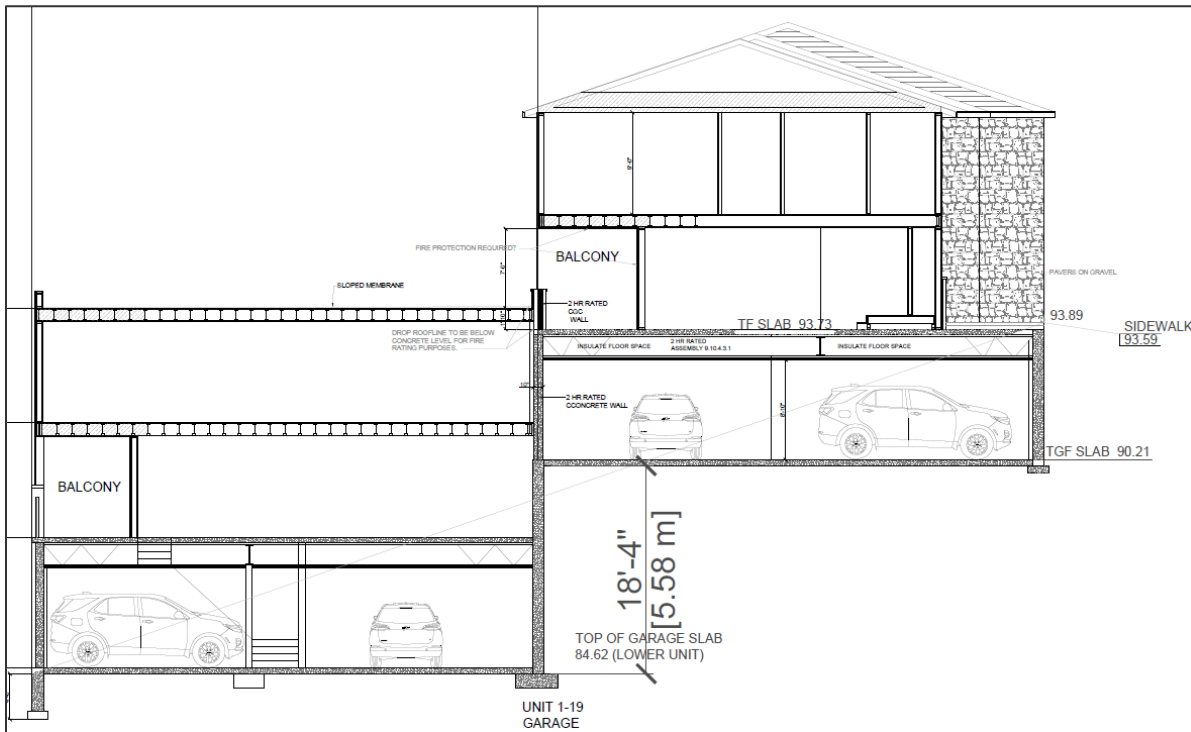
Building Cross-Section (Source: Glenn Dowds)
